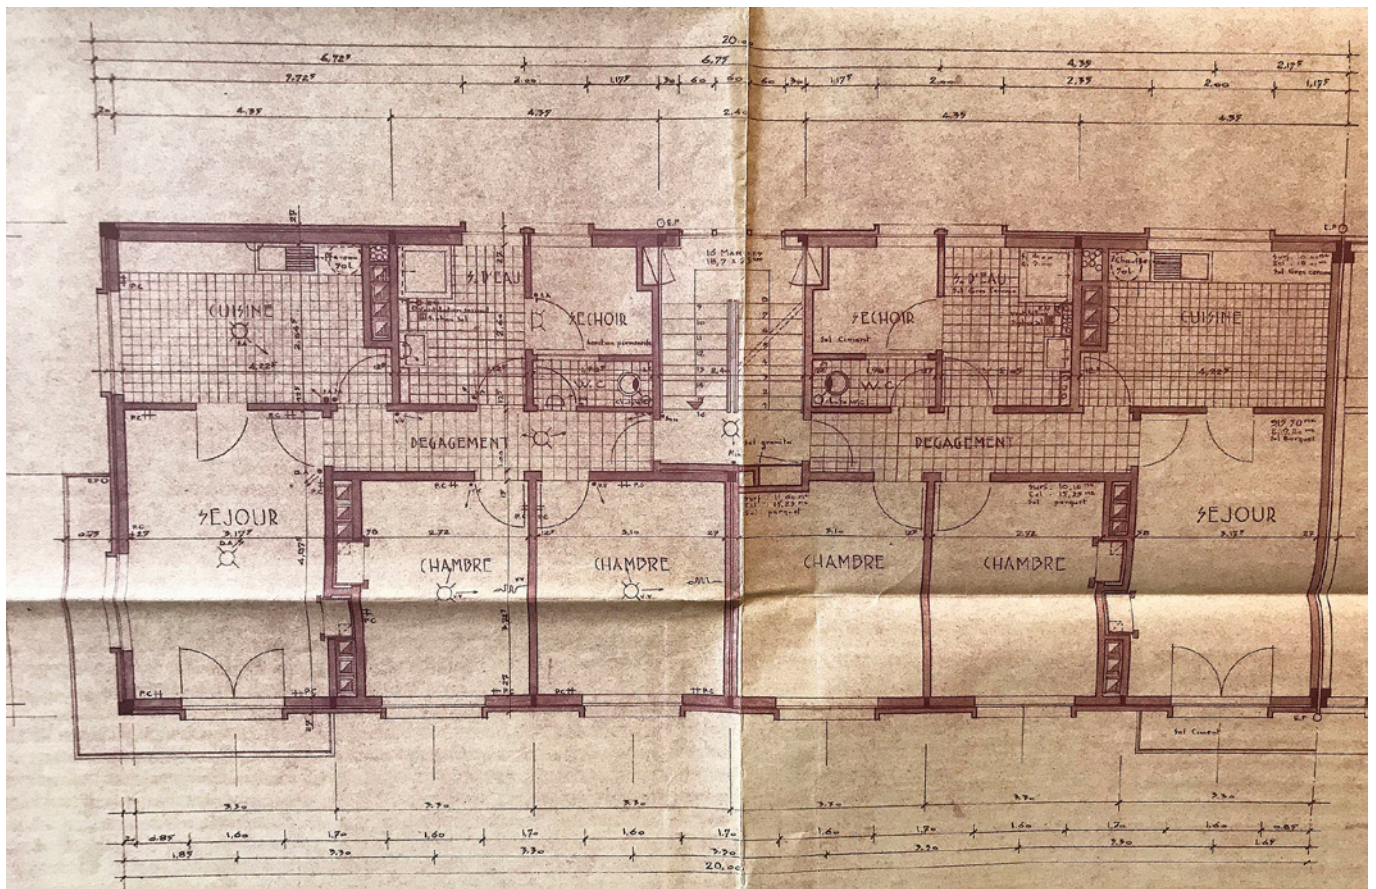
Lot 17, Building "A", plan of 3-room flats, drawing from the construction permit, 1949. Source: AMH, Fonds contemporain, demande de permis de construire, PC 1949/587.
